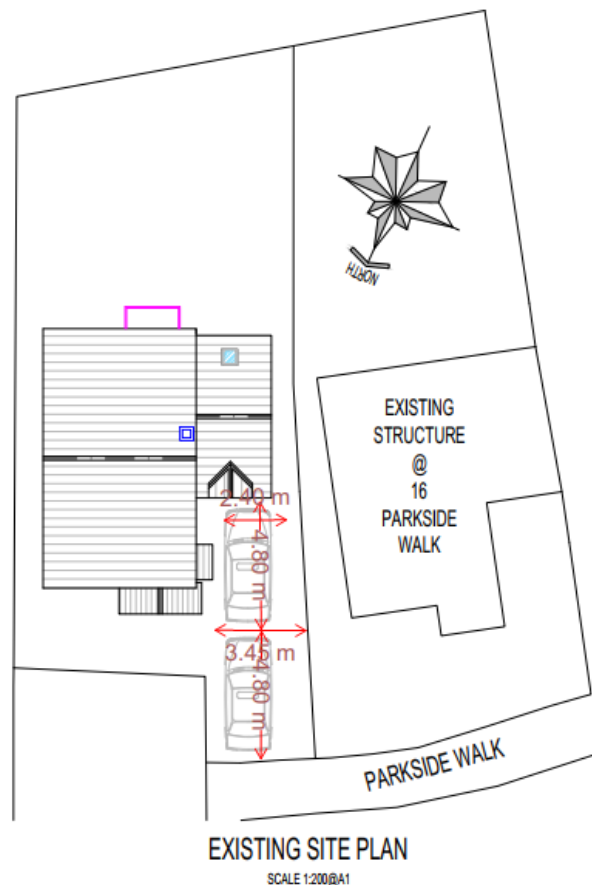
Extract of Existing Site Plan with measurements of car parking spaces
